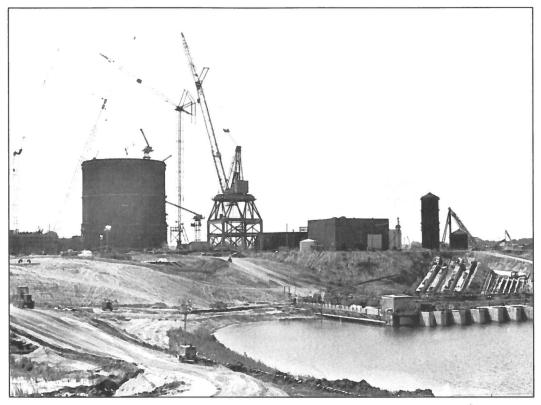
Construction Photograph of the CPS Site Looking Southwest, 1978
